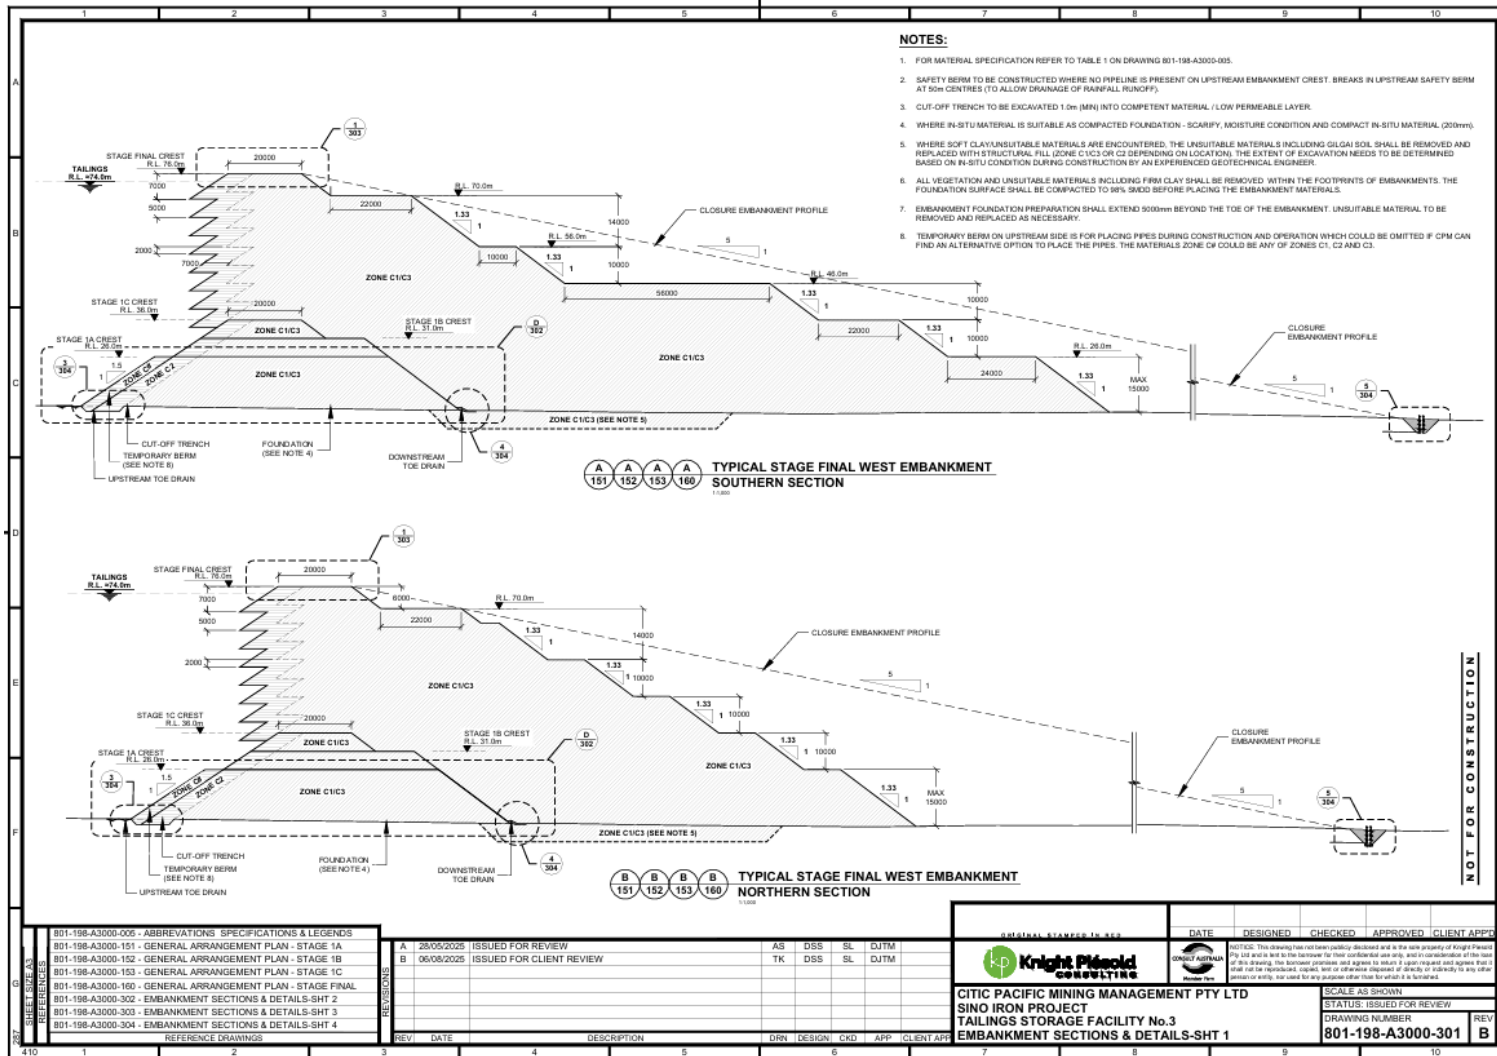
TSF 3 embankment sections (relevant only for Stages 1A, 1B and 1C)
